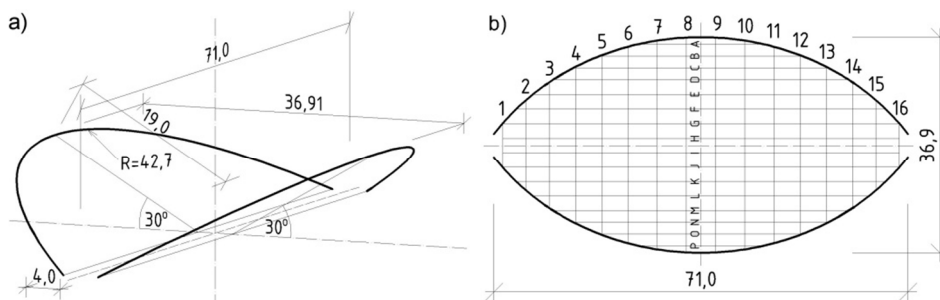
The structural arrangement of the a) edge arches in axonometric view and b) cable net system in plan view
